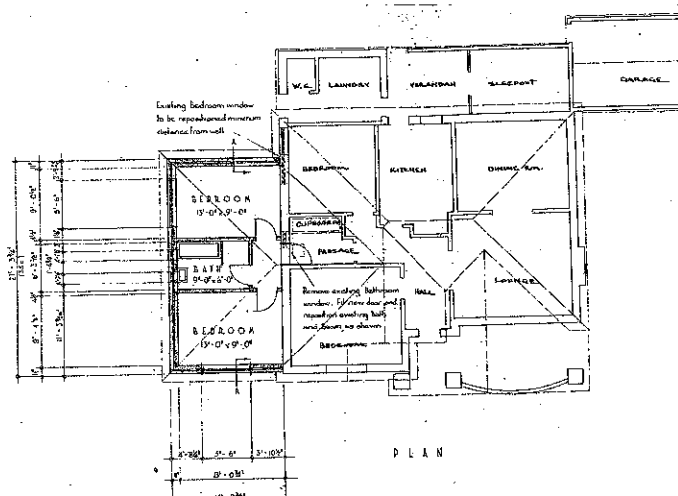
Building Licence Plan dated 29 August 1955, No. 1706/55.
